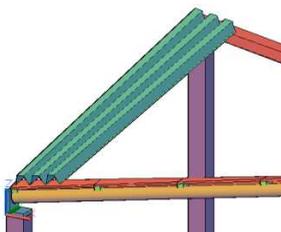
Geometrical shaping of the hall and its space cover made up of the unidirectional folded steel sheets
